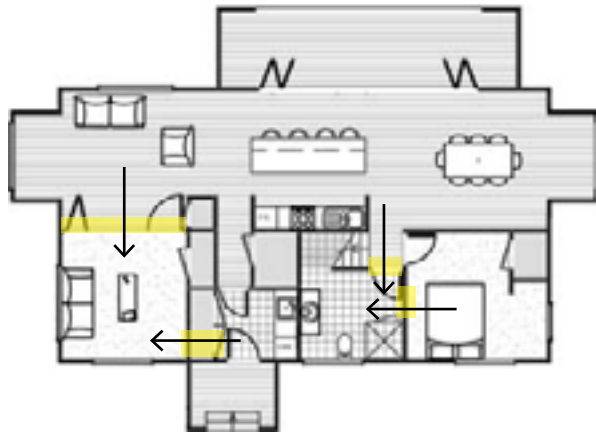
Large Version Ground Floor Plan. The yellow shading indicates the rooms which can easily be adapted for dual access.
